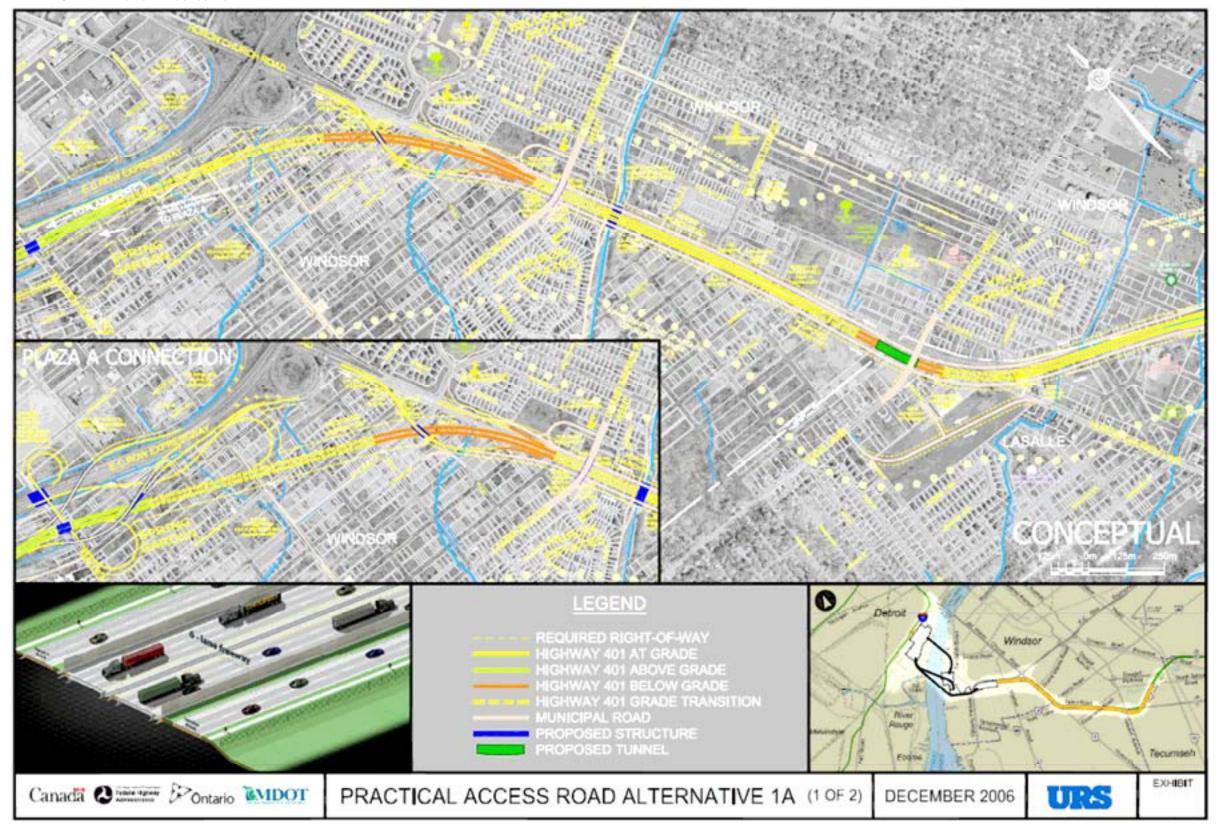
A- PRACTICAL ACCESS ROAD ALTERNATIVE 1A
